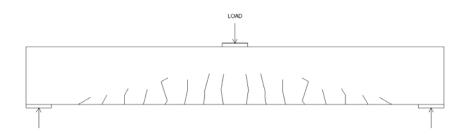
Cracking along Tensile Reinforcement for Standard Beam
